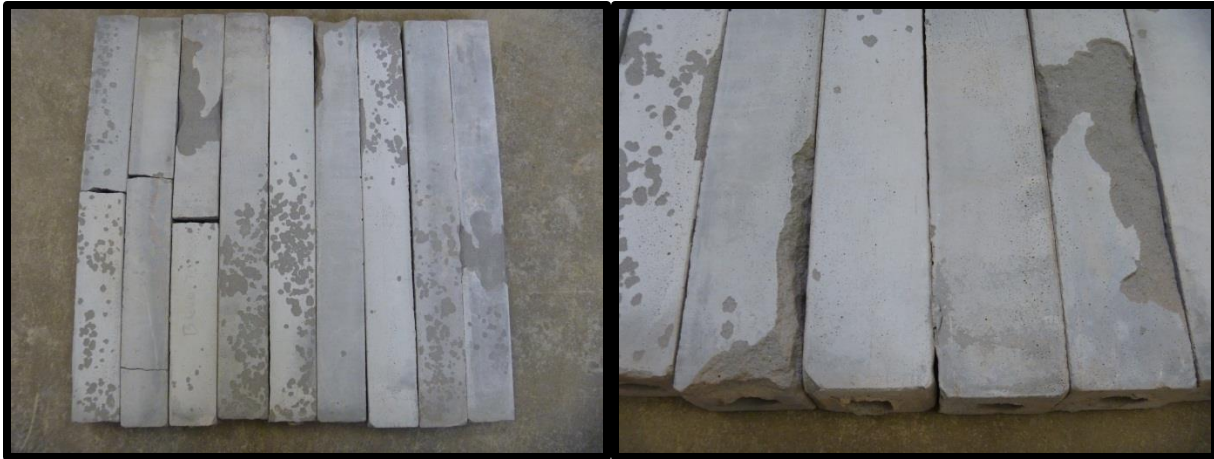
Spalling Damage to Beams during Preliminary Testing
